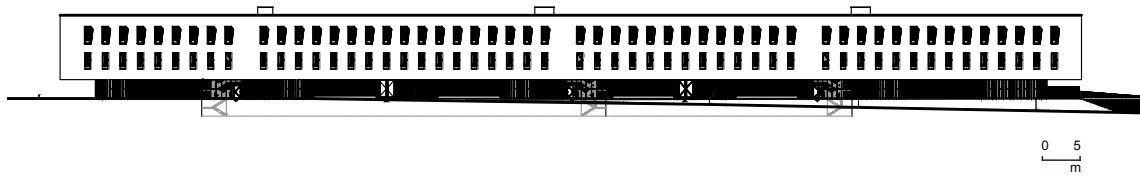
Quinta das Flores School's new building \_ Main façade
